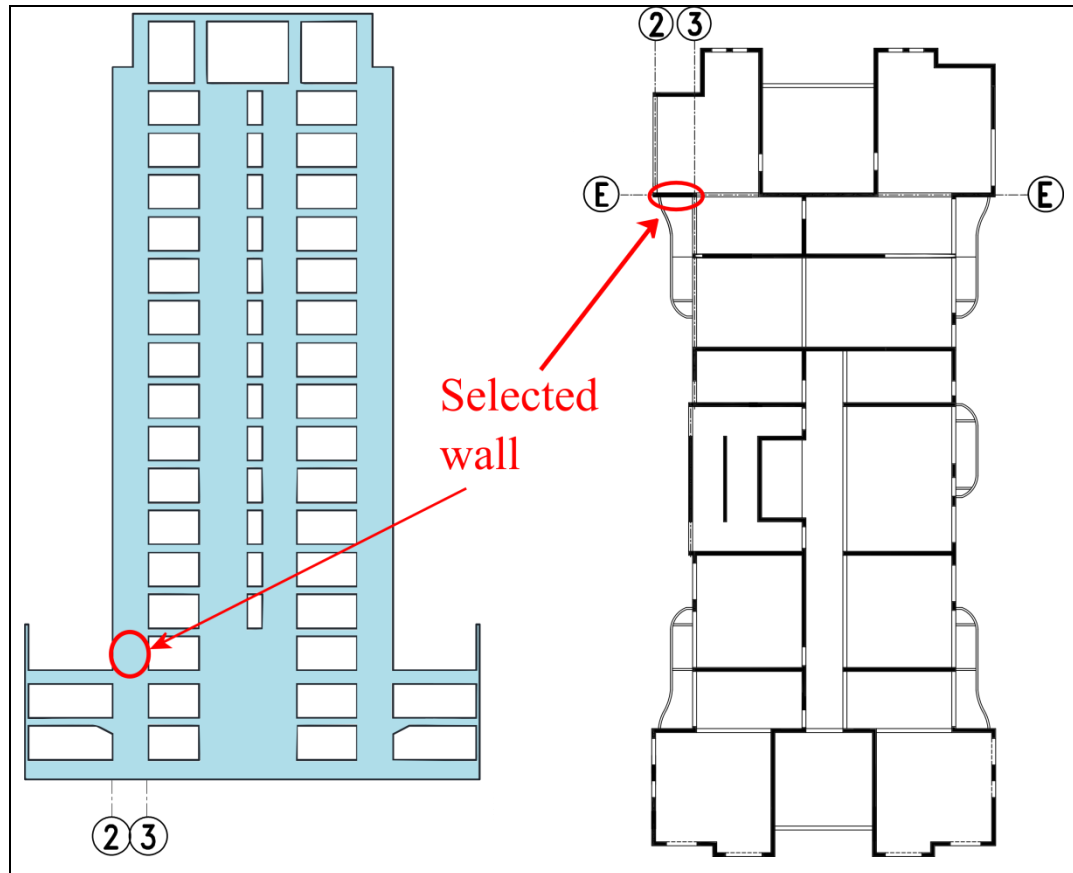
Elevation view of axis E from CM building and Plan view of second story from CM building
